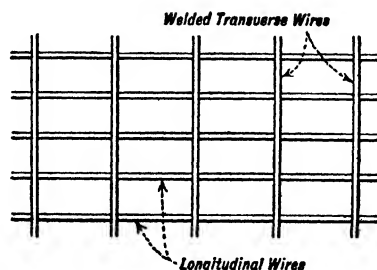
Welded Wire Fabric. (See p. 17.)
